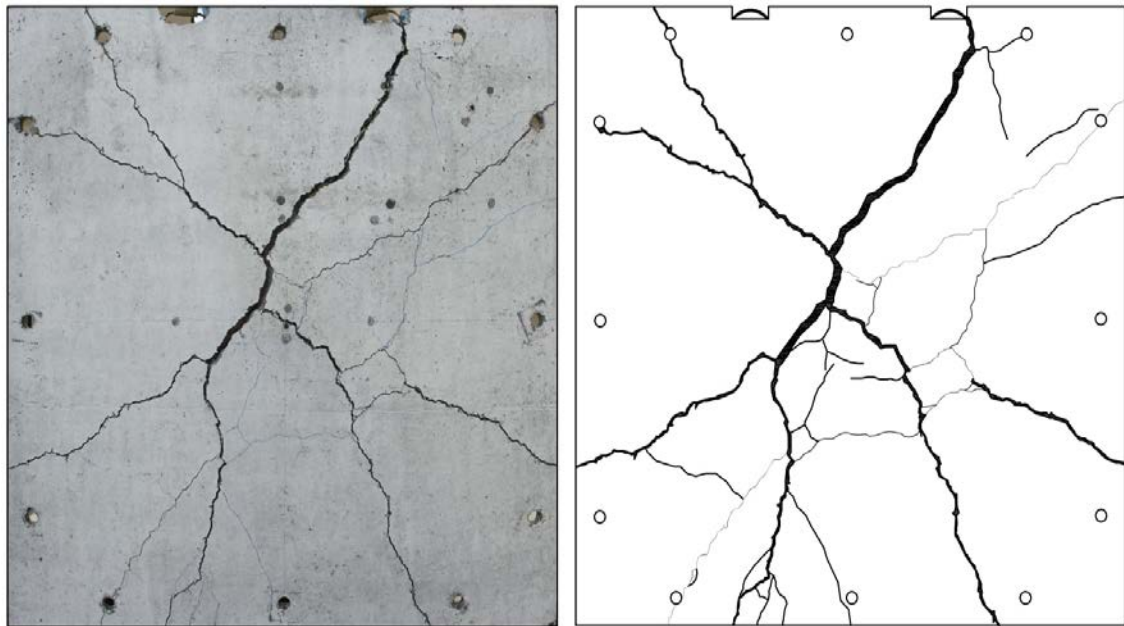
Rear Face Crack Patterns After Testing for Panel JA1-075+PVA
